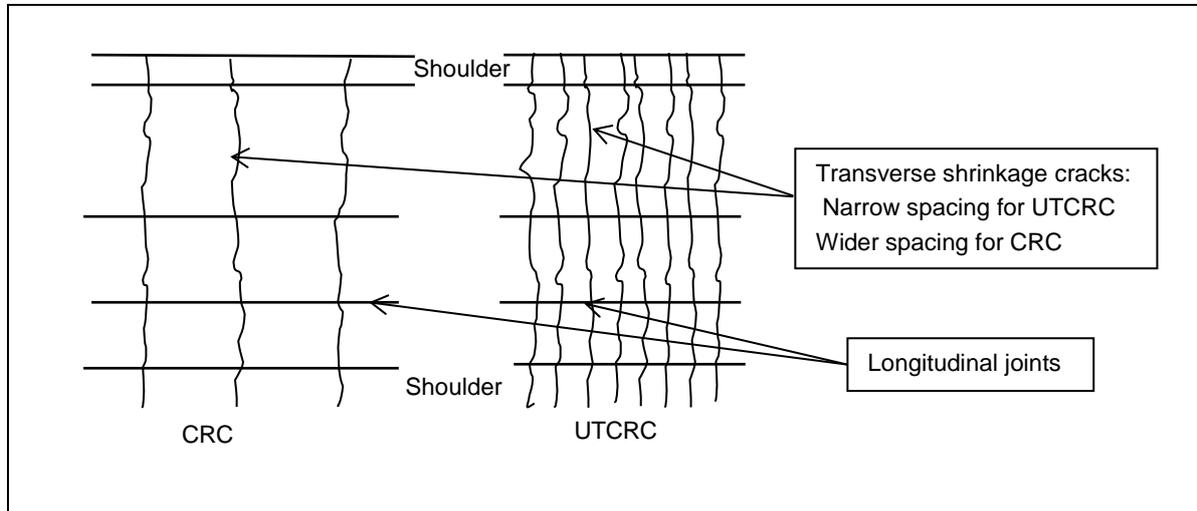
Typical types of cracking and jointing associated with continuously reinforced concrete pavements
